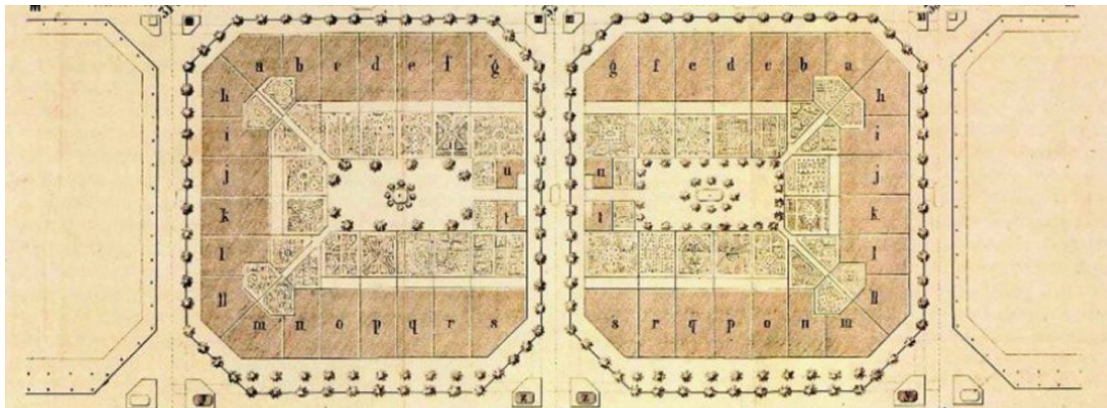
Two Blocks of original Cerdà Planning share one garden
